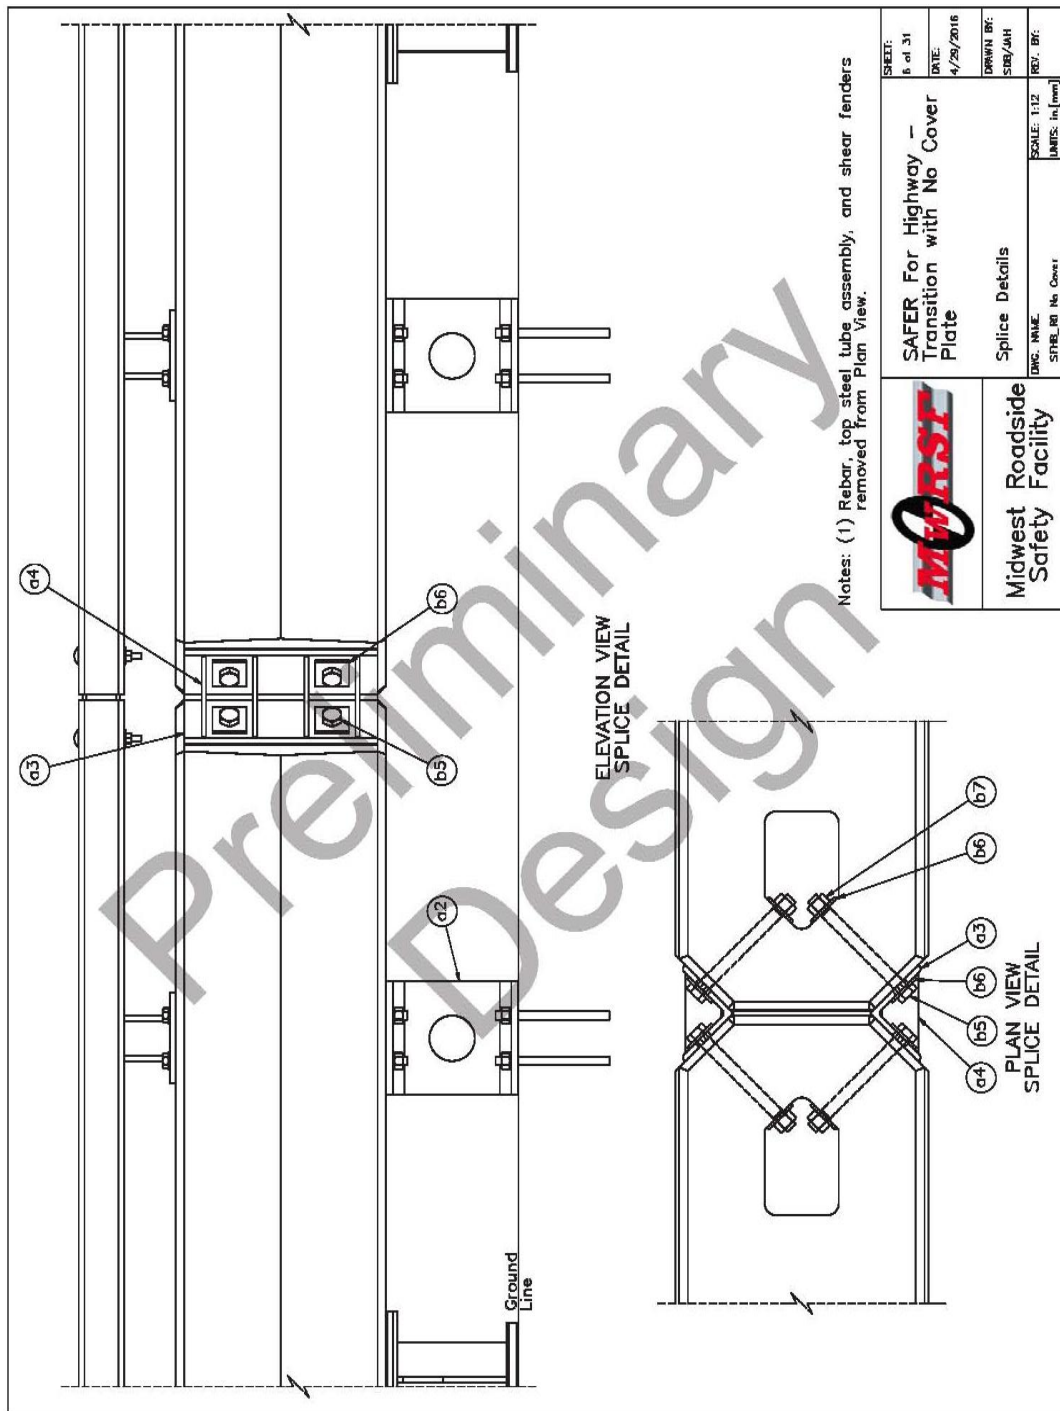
Splice Details, No Cover Plate, RESTORE Barrier Transition
